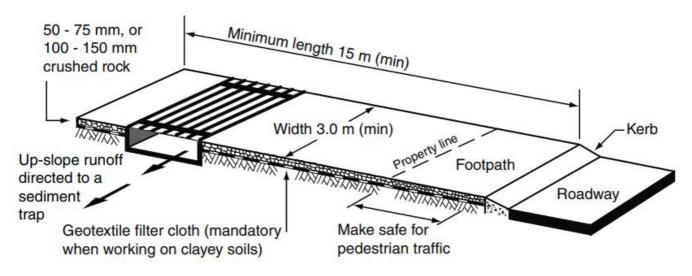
Typical layout of a rumble grid on a large construction site. Figure from Catchments and Creeks Pty Ltd.
